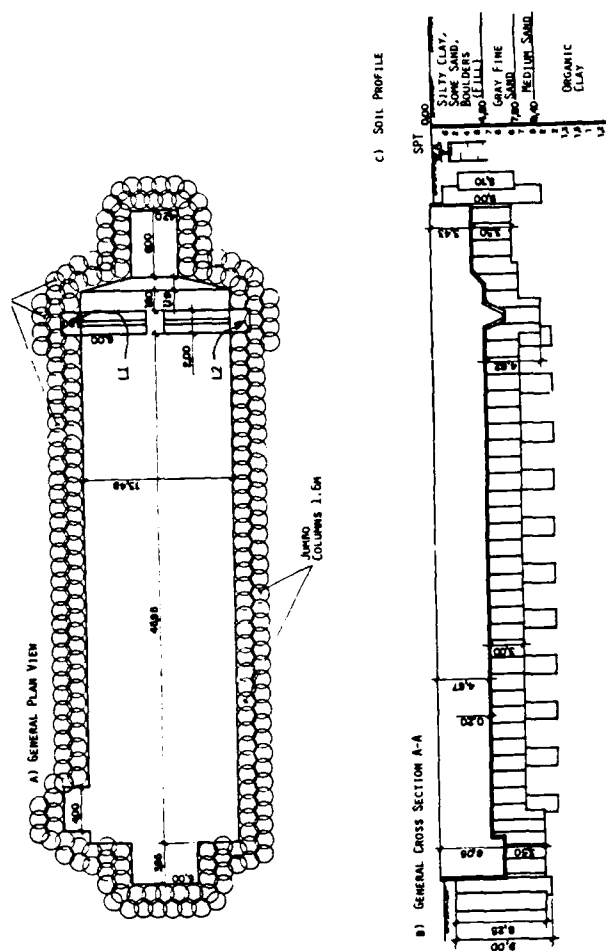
General Plan View and Profile of Petrobras Waste Pit P-3921
